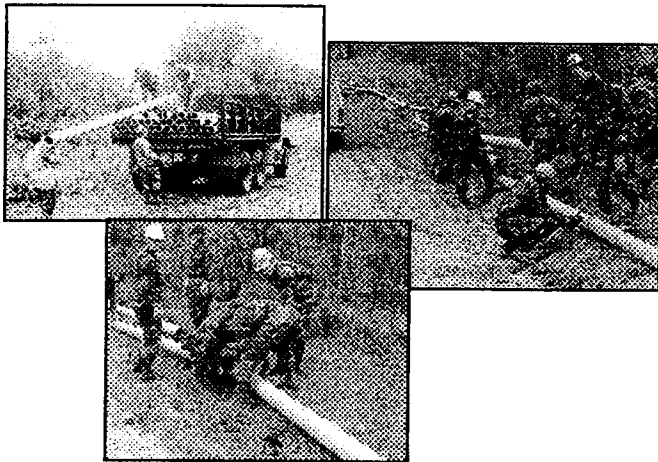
Soldiers offloading the pipe from the truck; installing an expansion loop; and installing the IPDS pipeline and connection every 19 feet.
